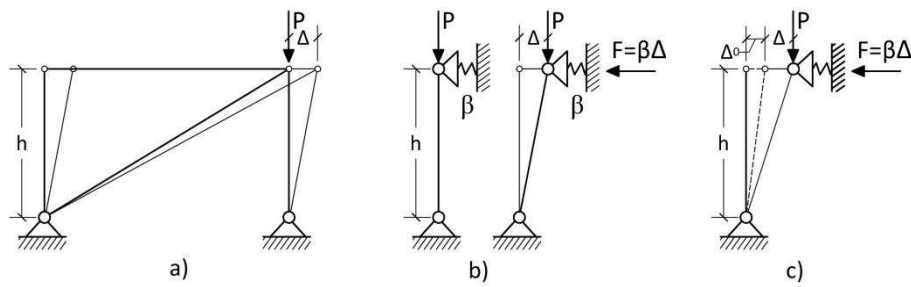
a) Horizontal deformation of a single story brace; b) Structural scheme equivalent to single story brace; c) Structural scheme equivalent to single story brace considering initial imperfections
